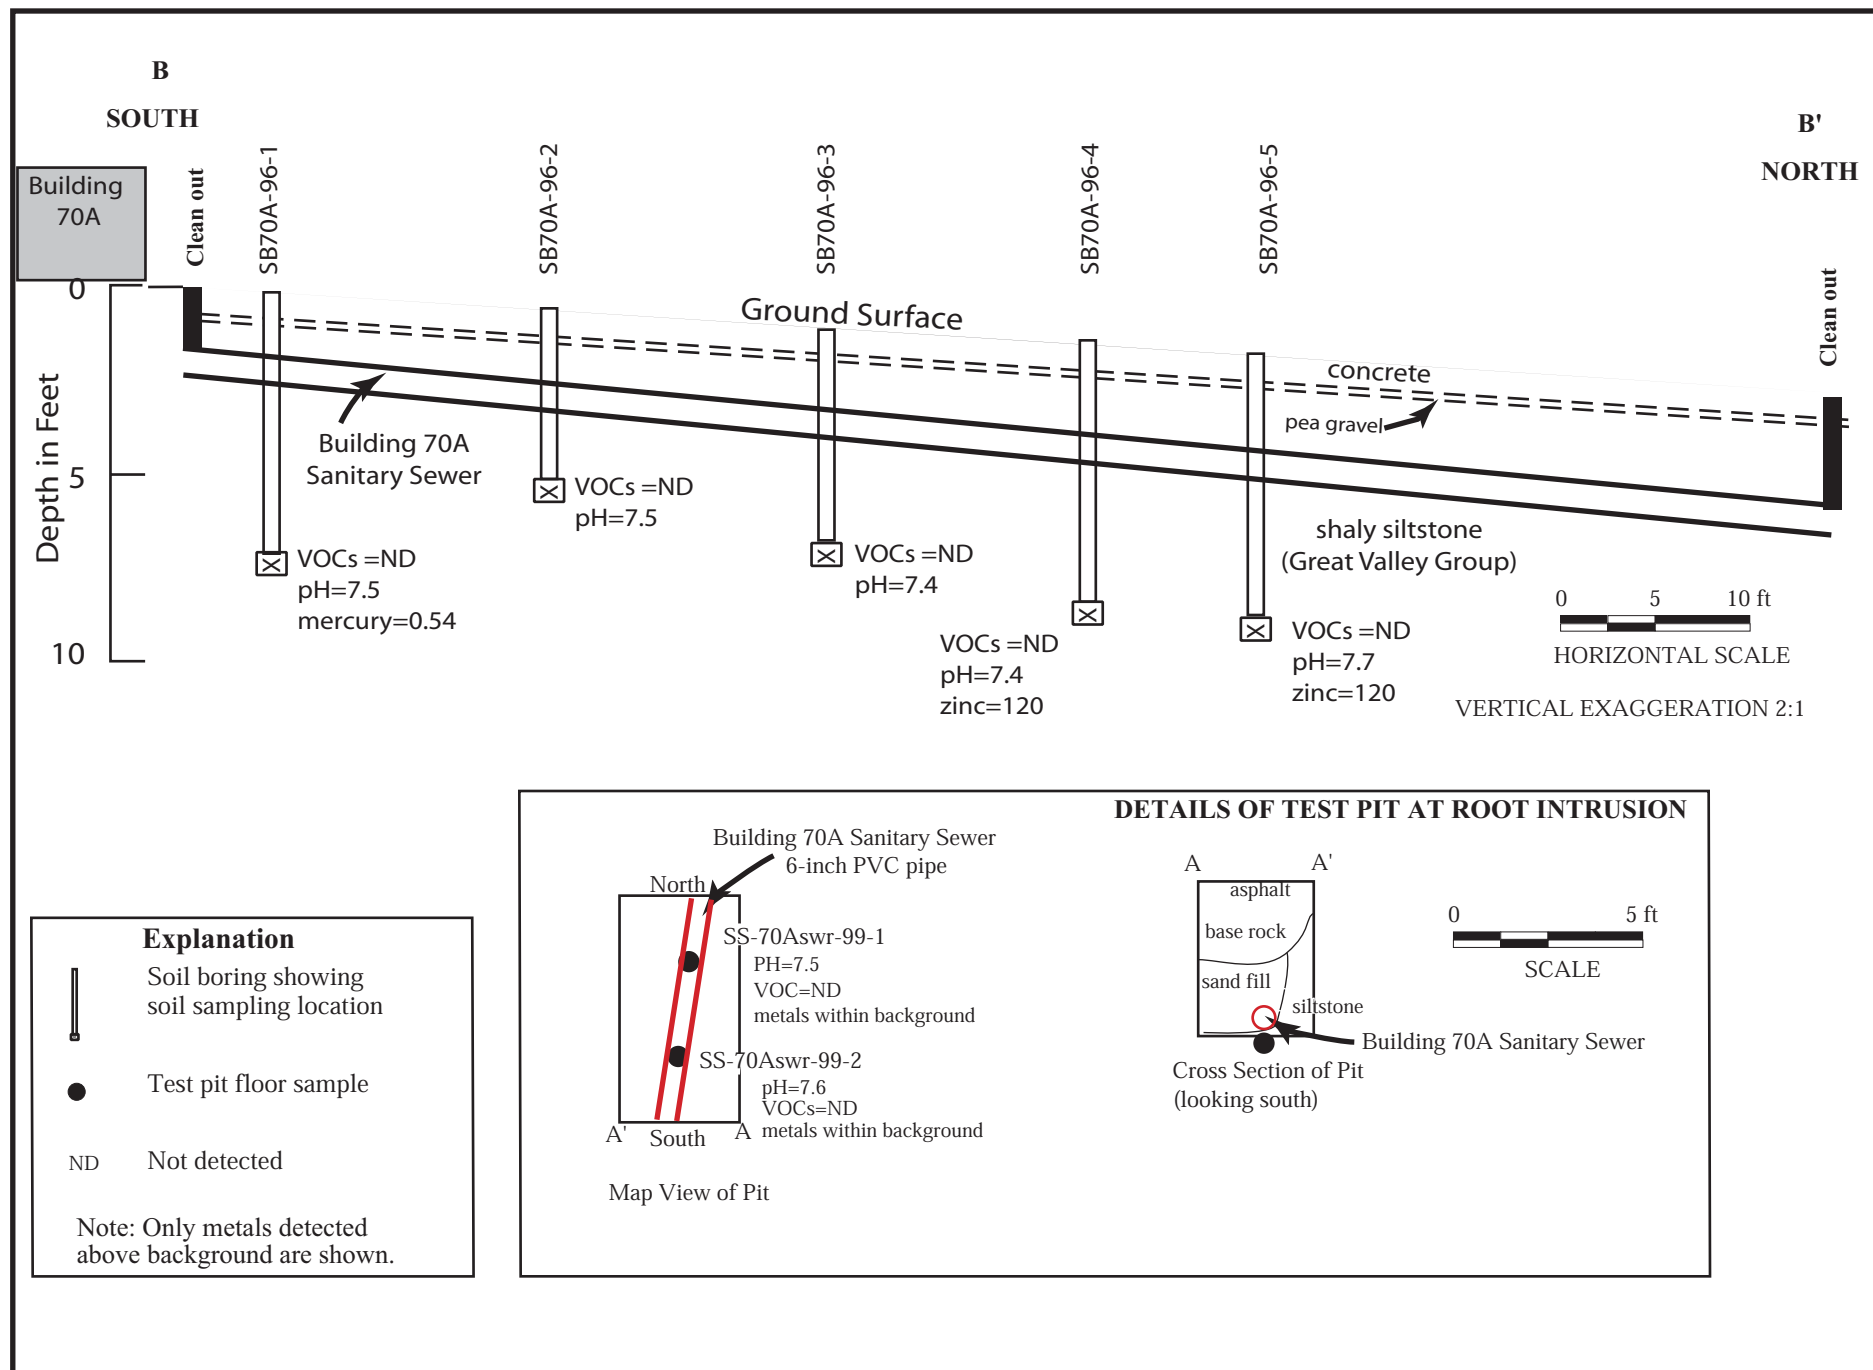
Cross Section Along Building 70A Sanitary Sewer Line (AOC 8-7) and Details of Test Pit Showing Sampling Results
